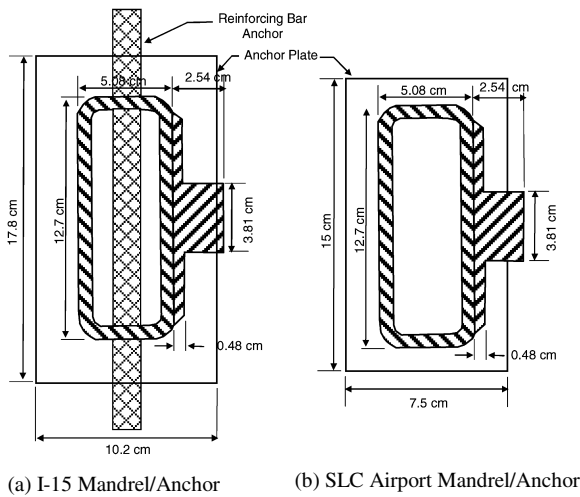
Geometry of mandrel and anchor plates used to install vertical PV drains at (a) I-15 test site (b) SLC Airport test site
